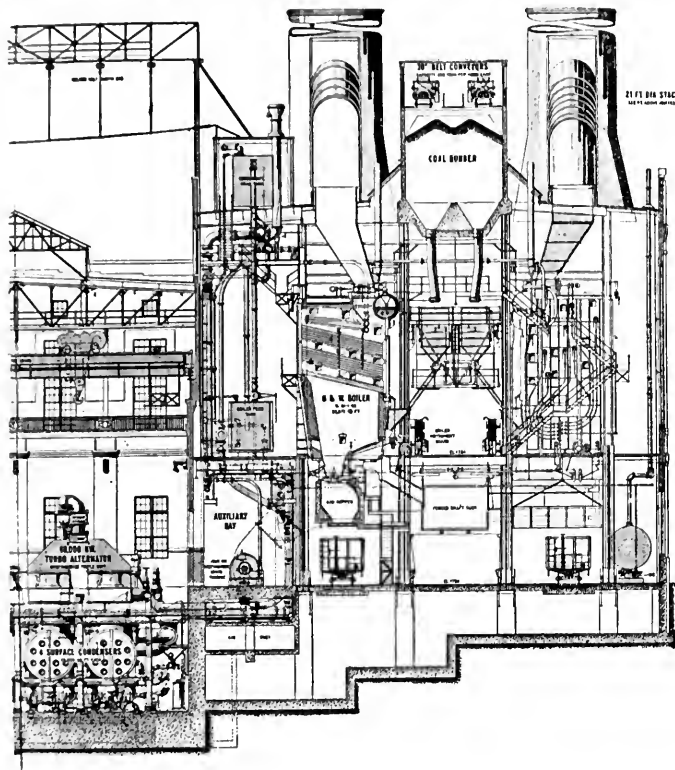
CROSS-SECTION OF BOILER HOUSE AND PART OF TURBINE ROOM
